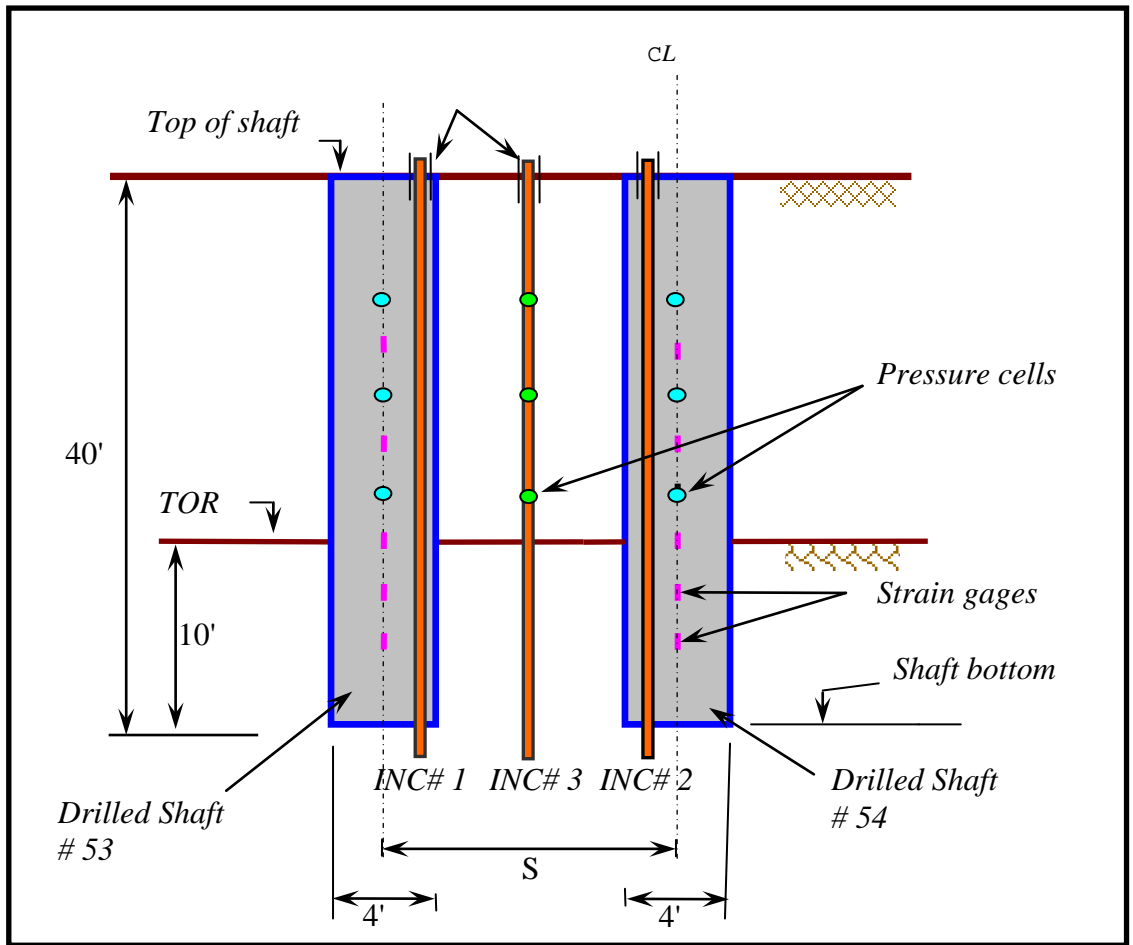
WAS-7 Instrumentation Plans (Cross-section 2)
